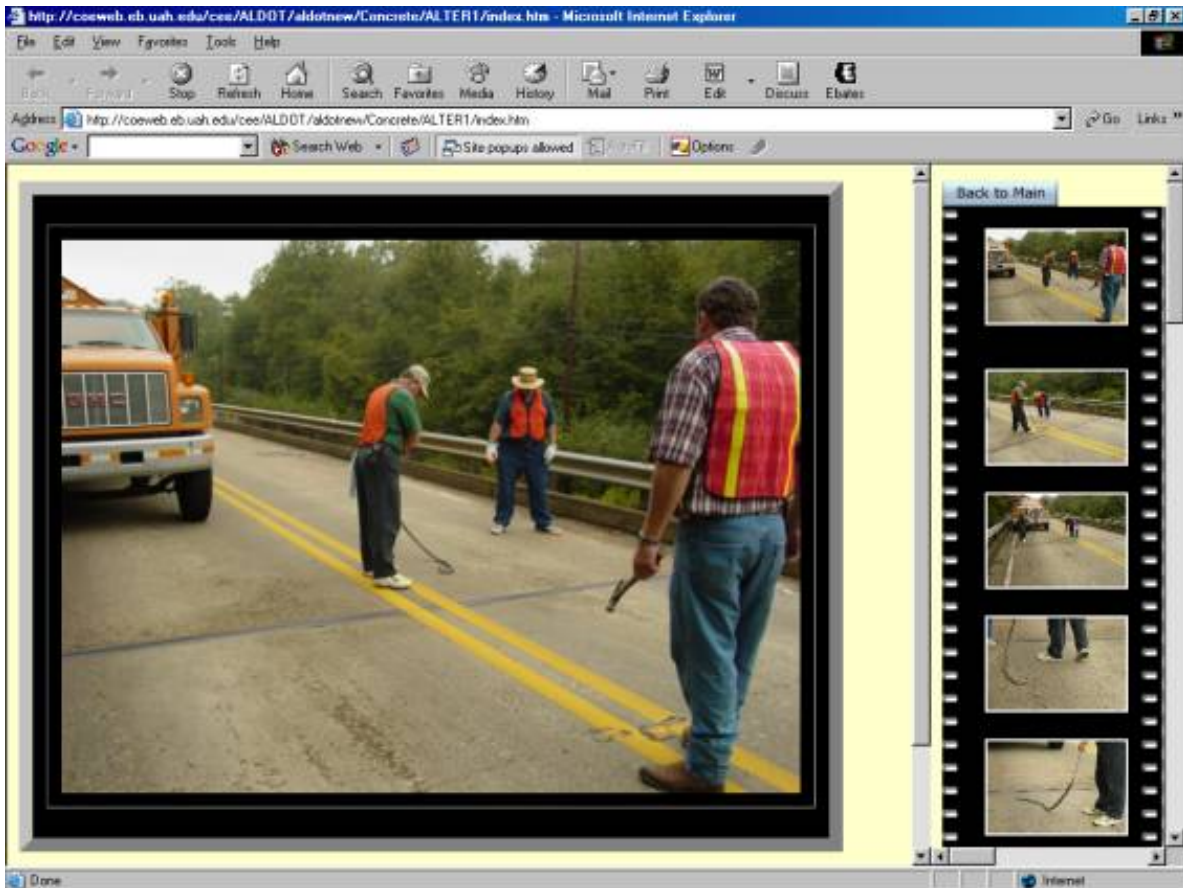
Photo of concrete bridge inspection in progress
